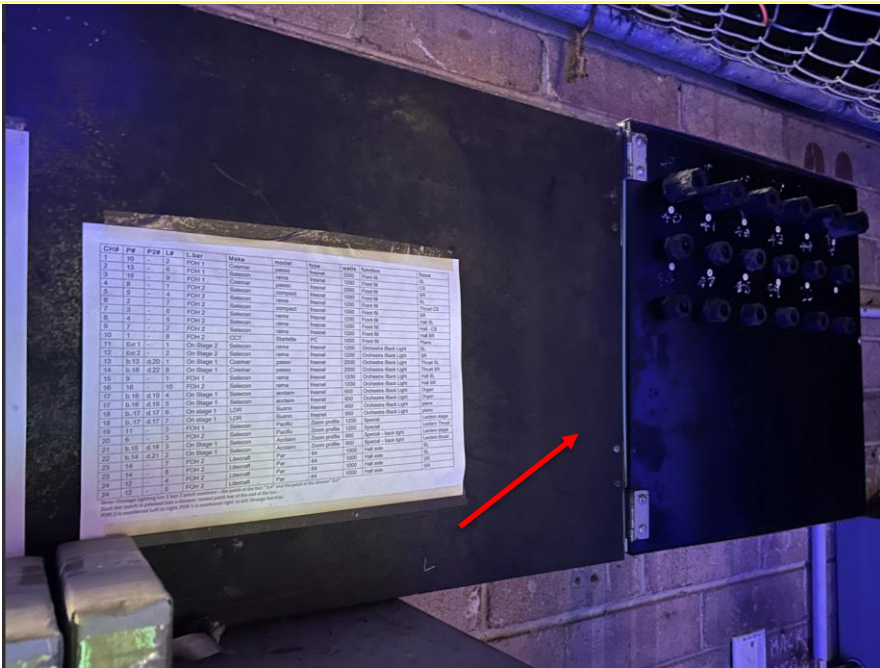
Asbestos containing electrical backing board, back of stage, Centenary Hall
